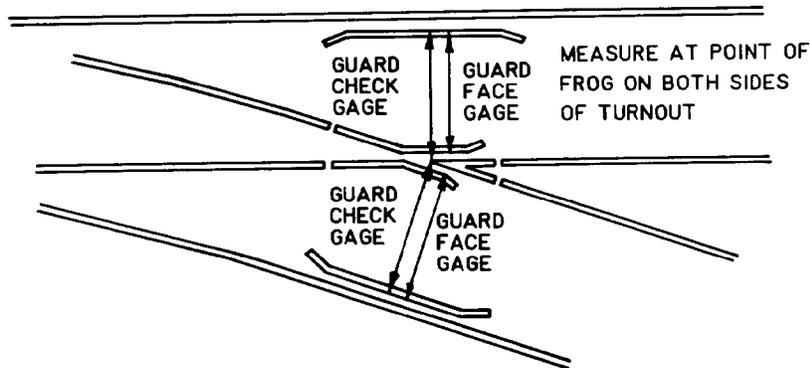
Measurement of flangeway width, flangeway depth, guard check gage, and guard face gage.
